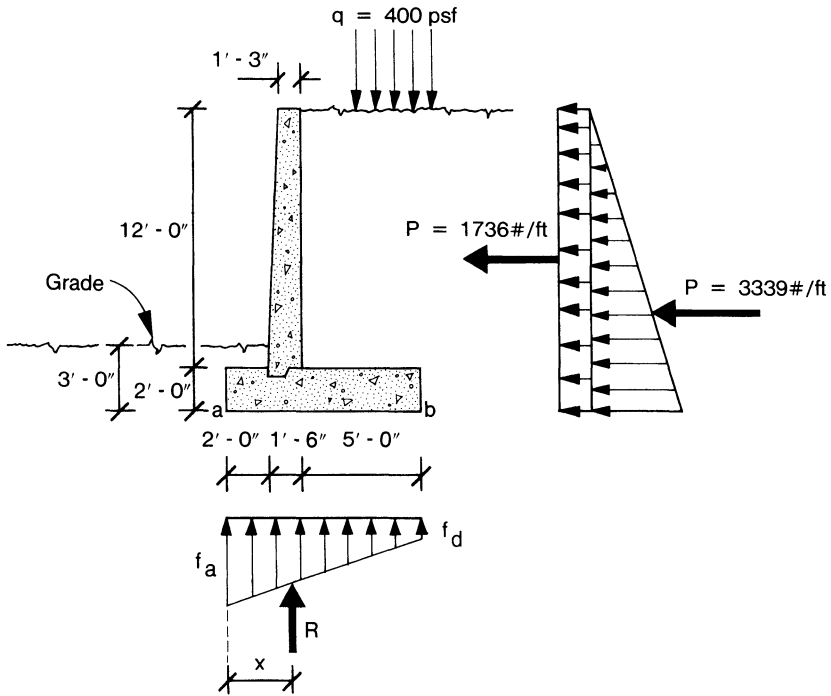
Example 11-5—Overturning moment and stability of a cantilever retaining wall.
